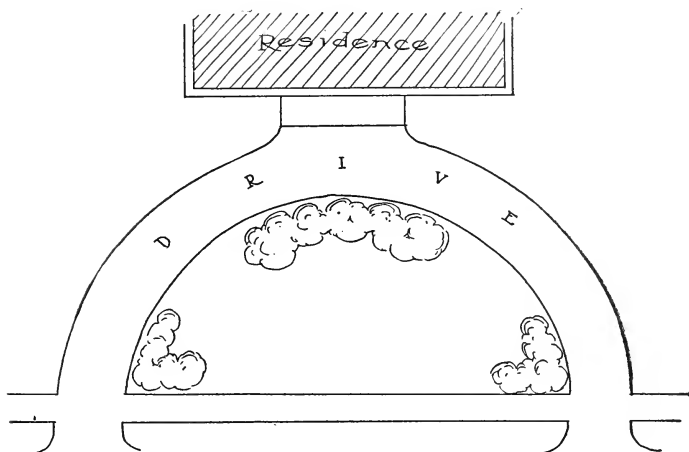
An attractive driveway arrangement where a house is centrally located on a large city or suburban lot
